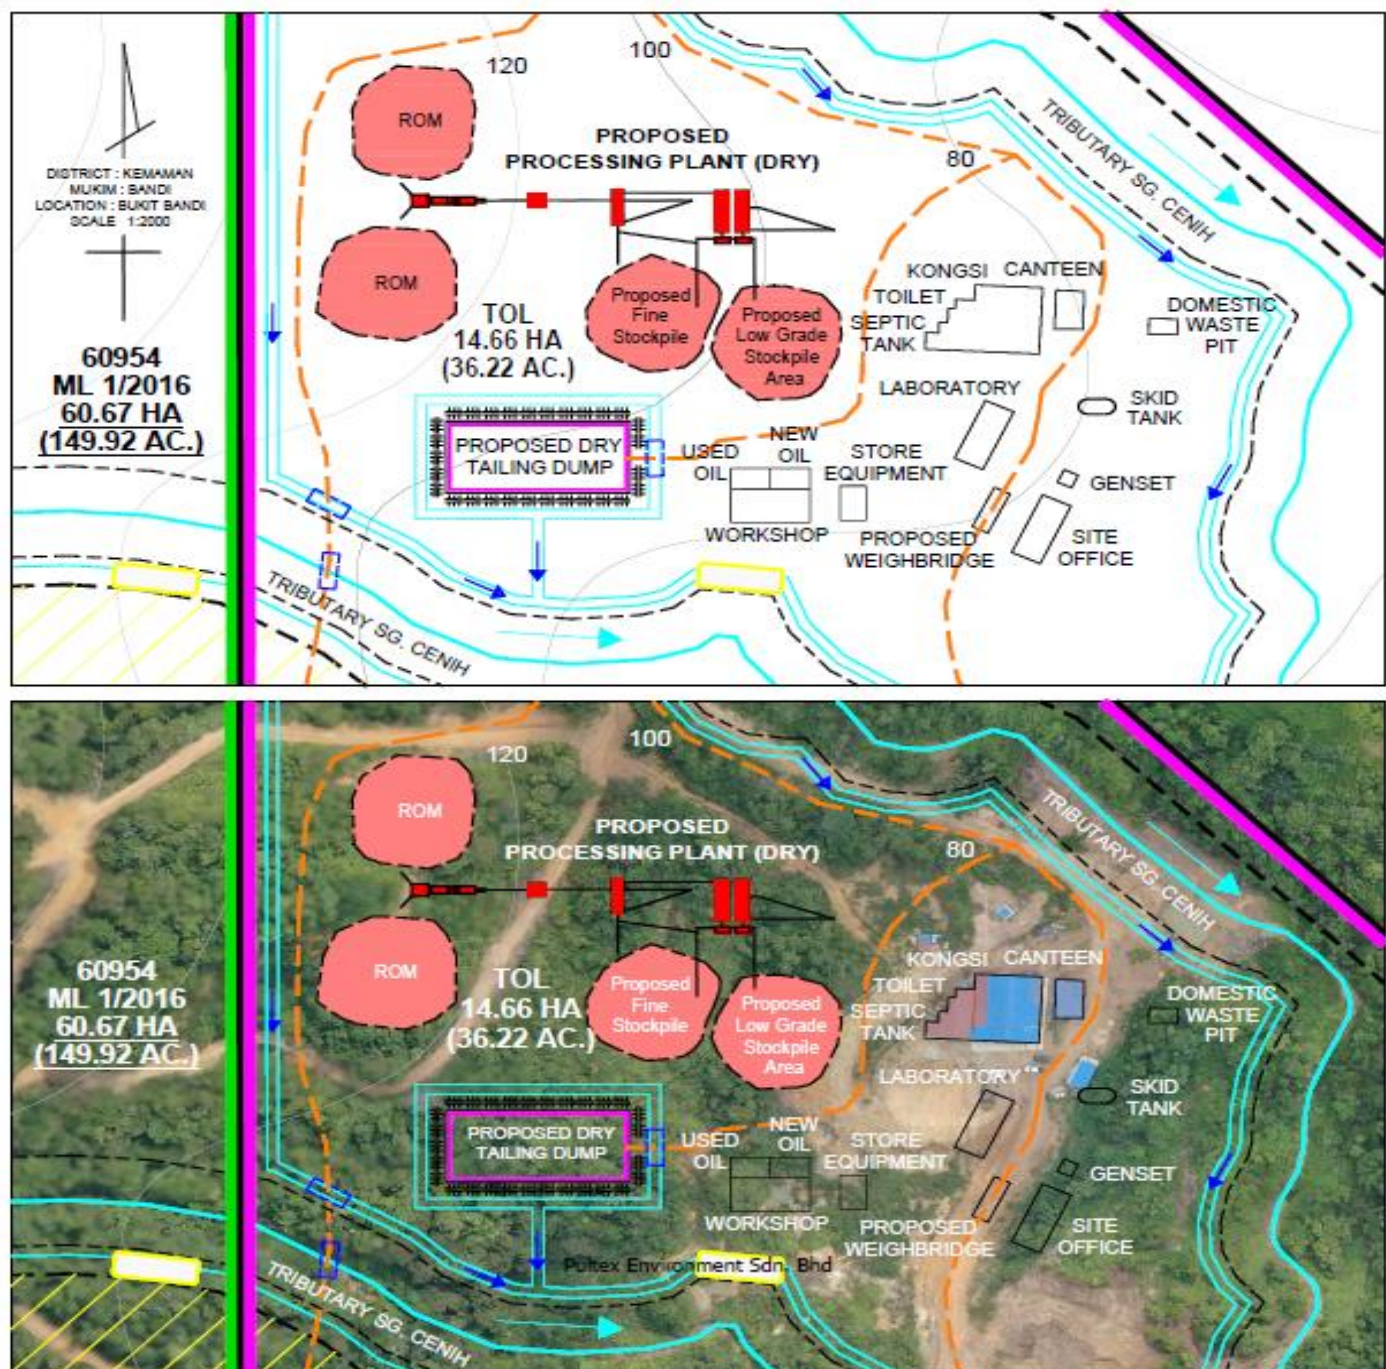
(a) : KEY, LOCATION AND SITE PLANS OF THE PROPOSED PROJECT SITE (ML LOT 60954) AND TOL LAND (UNDER APPLICATION)
